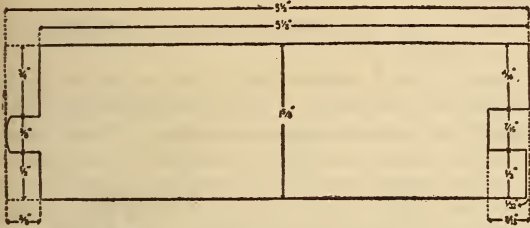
Standard sizes of heavy flooring; 2 by 6 flooring
